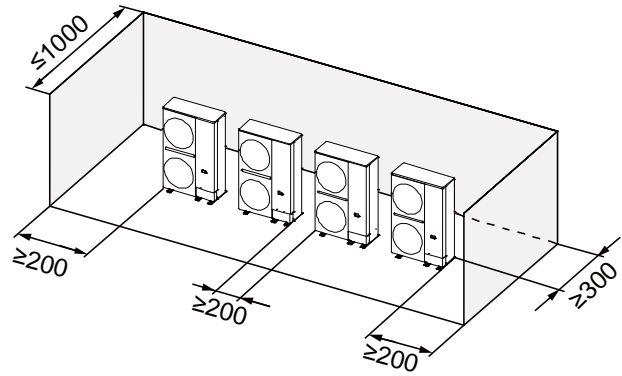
More than one outdoor unit installation (unit: mm)
